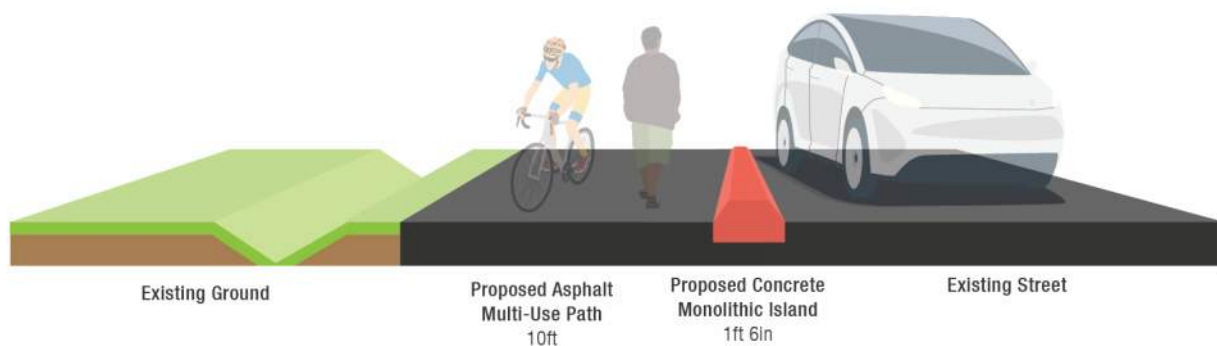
Ridgecrest Trail Connector In-Street Multi-Use Path Typical Section
